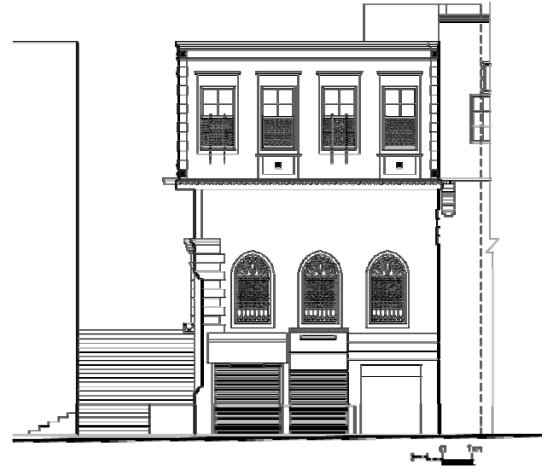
Bayt al-Sitt 'Awatif: Elevation of the Eastern façade
